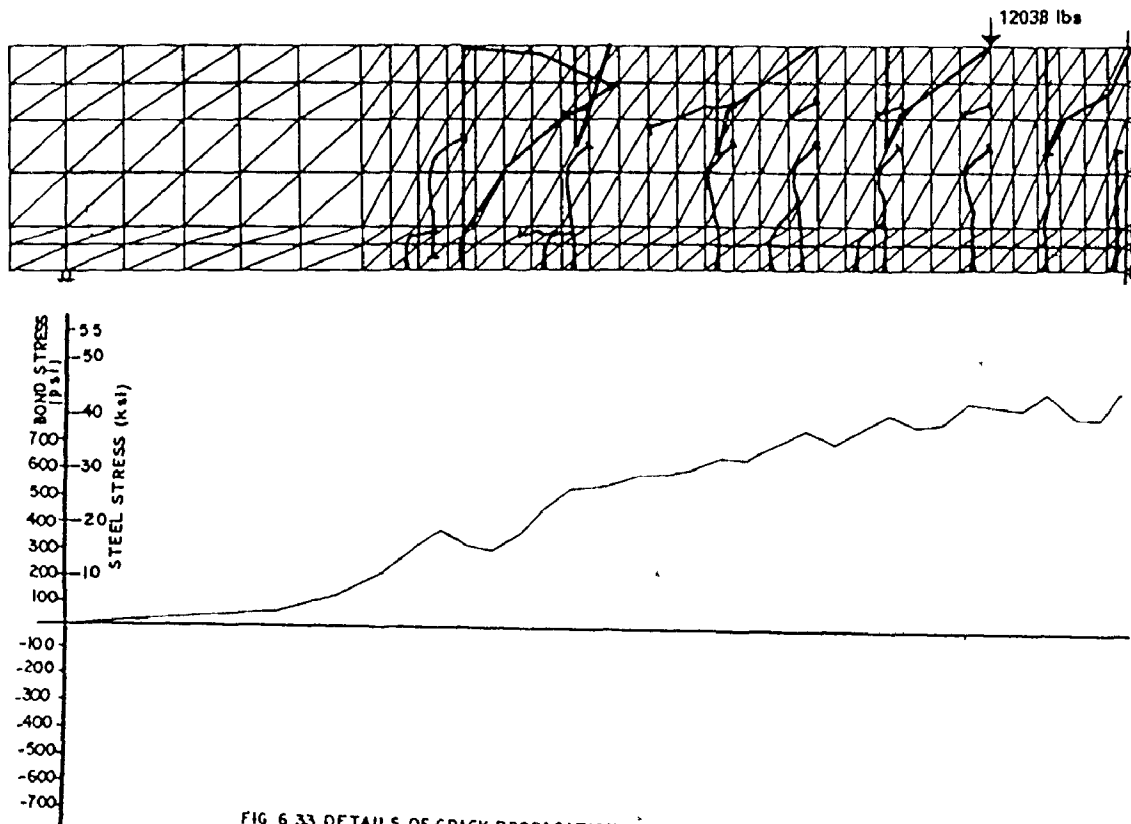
33 DETAILS OF CRACK PROPAGATION AND CONCRETE, STEEL AND BOND STRESS DISTRIBUTIONS FOR BEAM(7/1)
